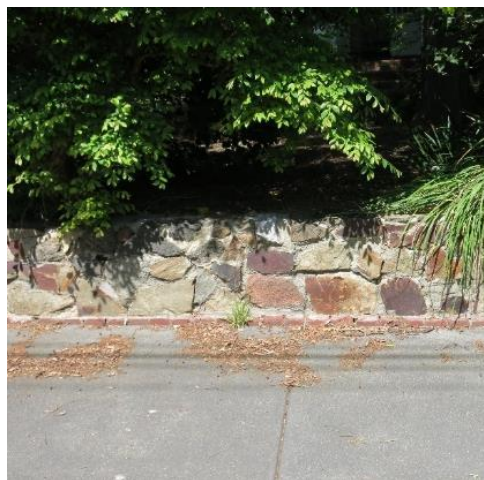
Detail of front low garden wall with footing of original brick fence beneath. (Source: Trethowan Architecture, 2018)
